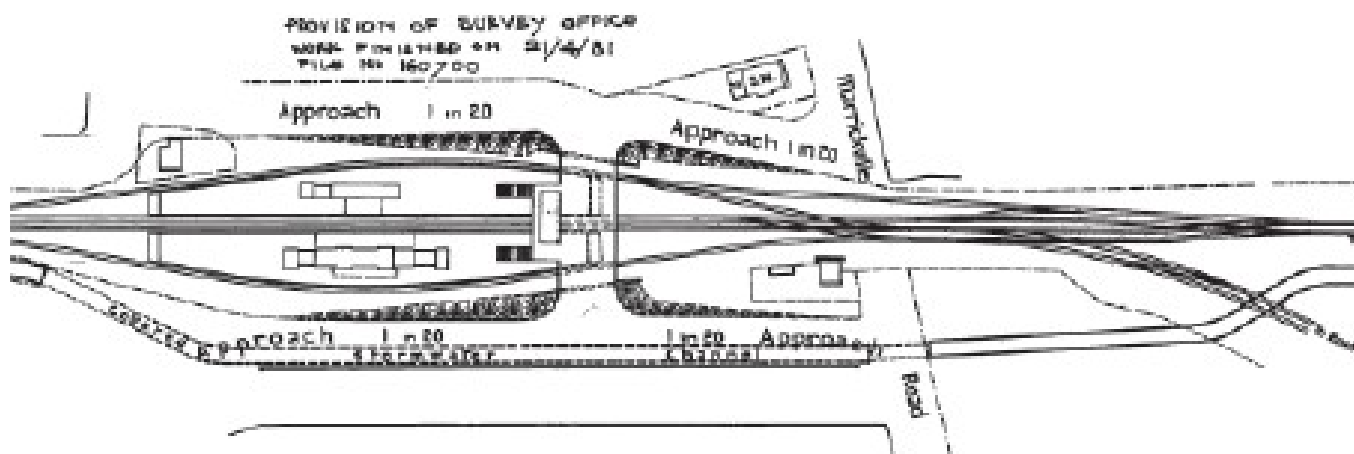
1881 Plan of Marrickville (Sydenham) Station showing original platform configuration (Source: State Records, NSW, 17420_a014_a014000815)
